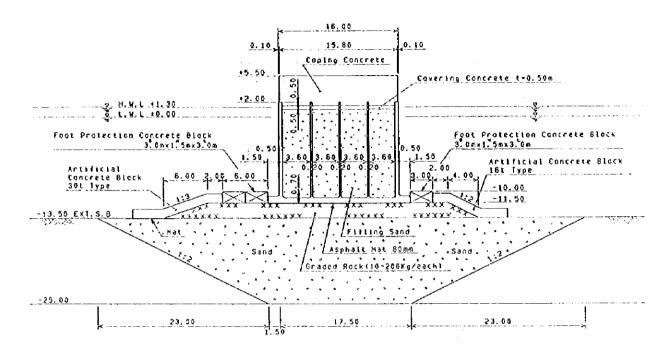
(1) Typical Cross Section of Breakwater (RC Caisson)
